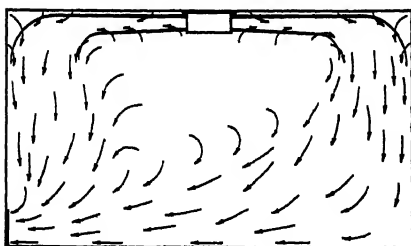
ELEVATION VIEW CEILING SUPPLY OUTLET WITH RETURN WALL OUTLET
